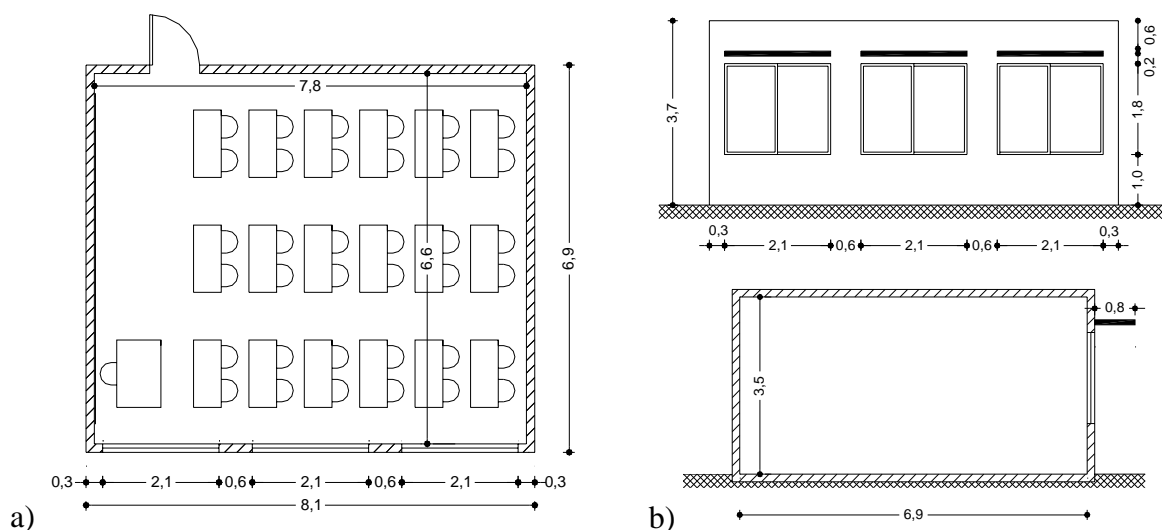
Plan (a), view and section (b) of a typical classroom -model C_0 -.
